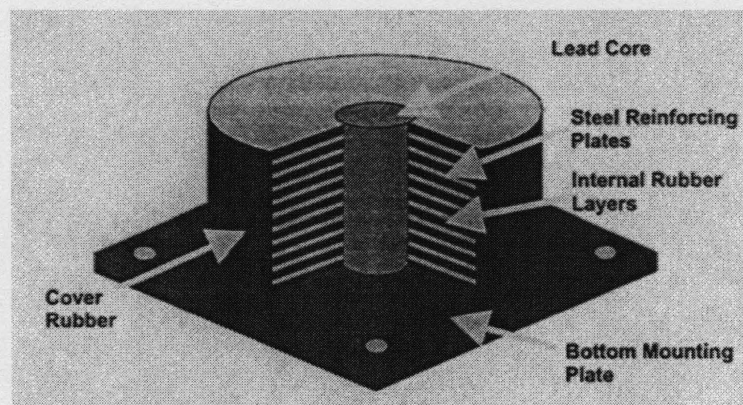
Typical lead-plug rubber bearing; top mounting plate not shown (Taylor and Igussa 2004)
